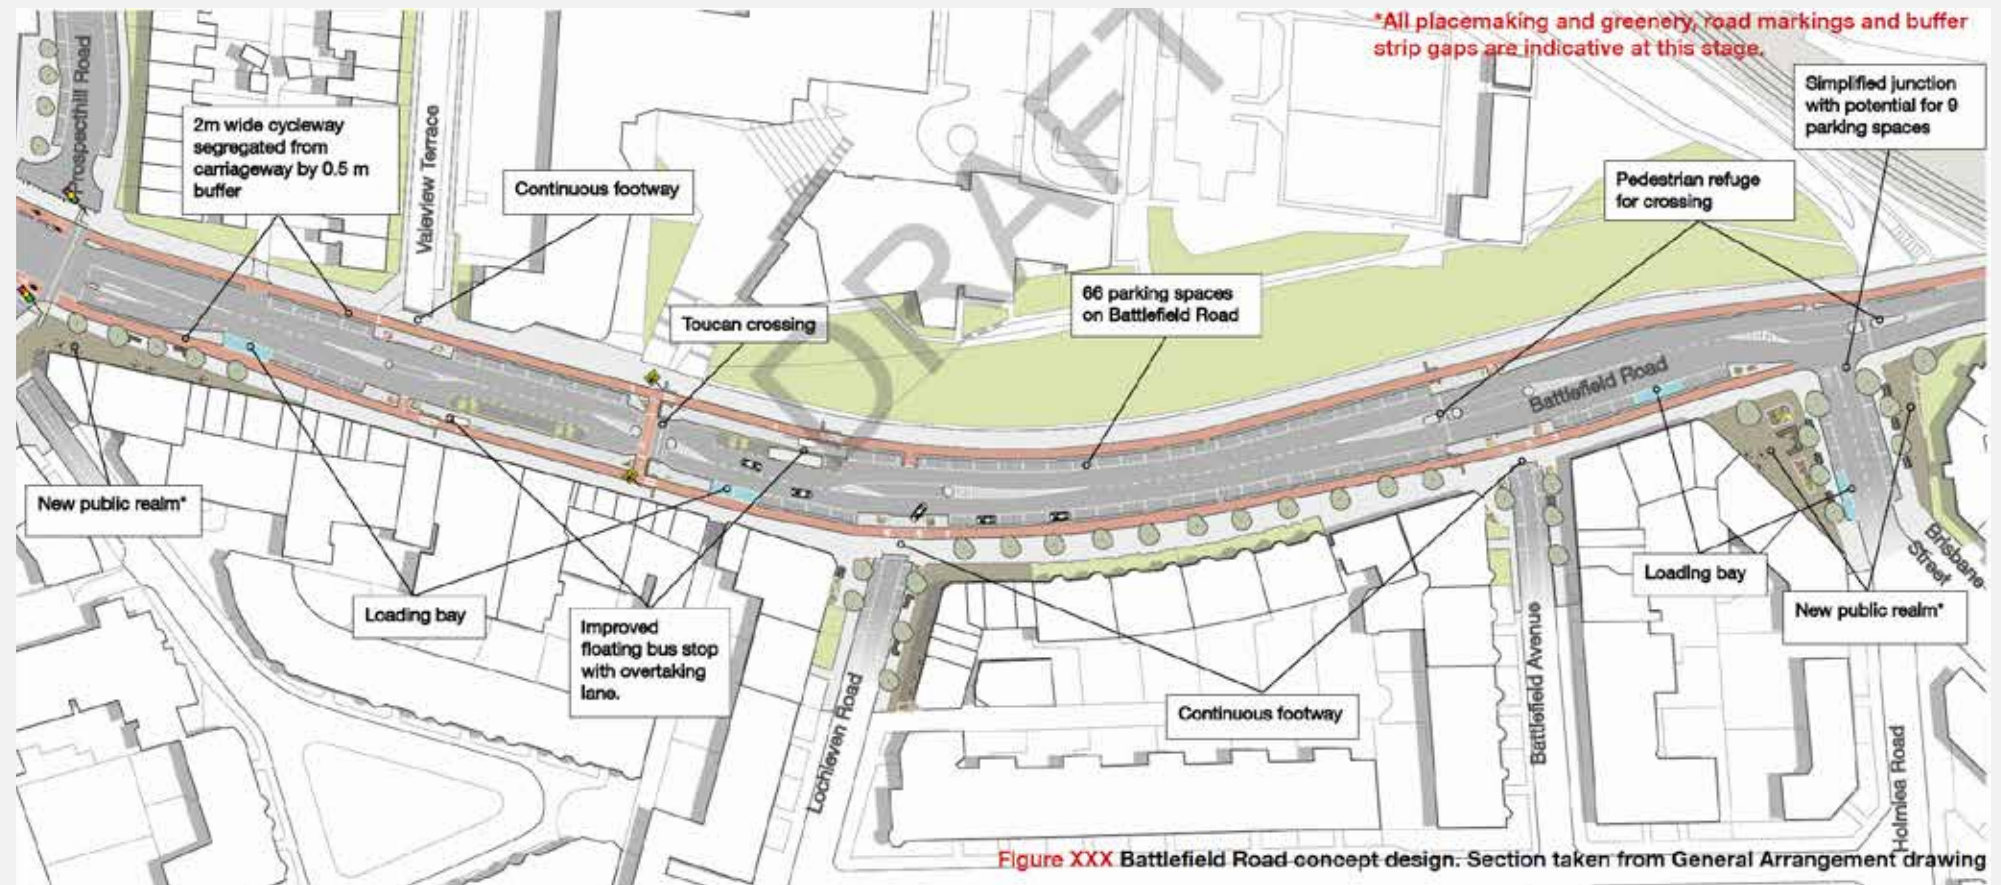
Figure XXX Battlefield Road concept design. Section taken from General Arrangement drawing
